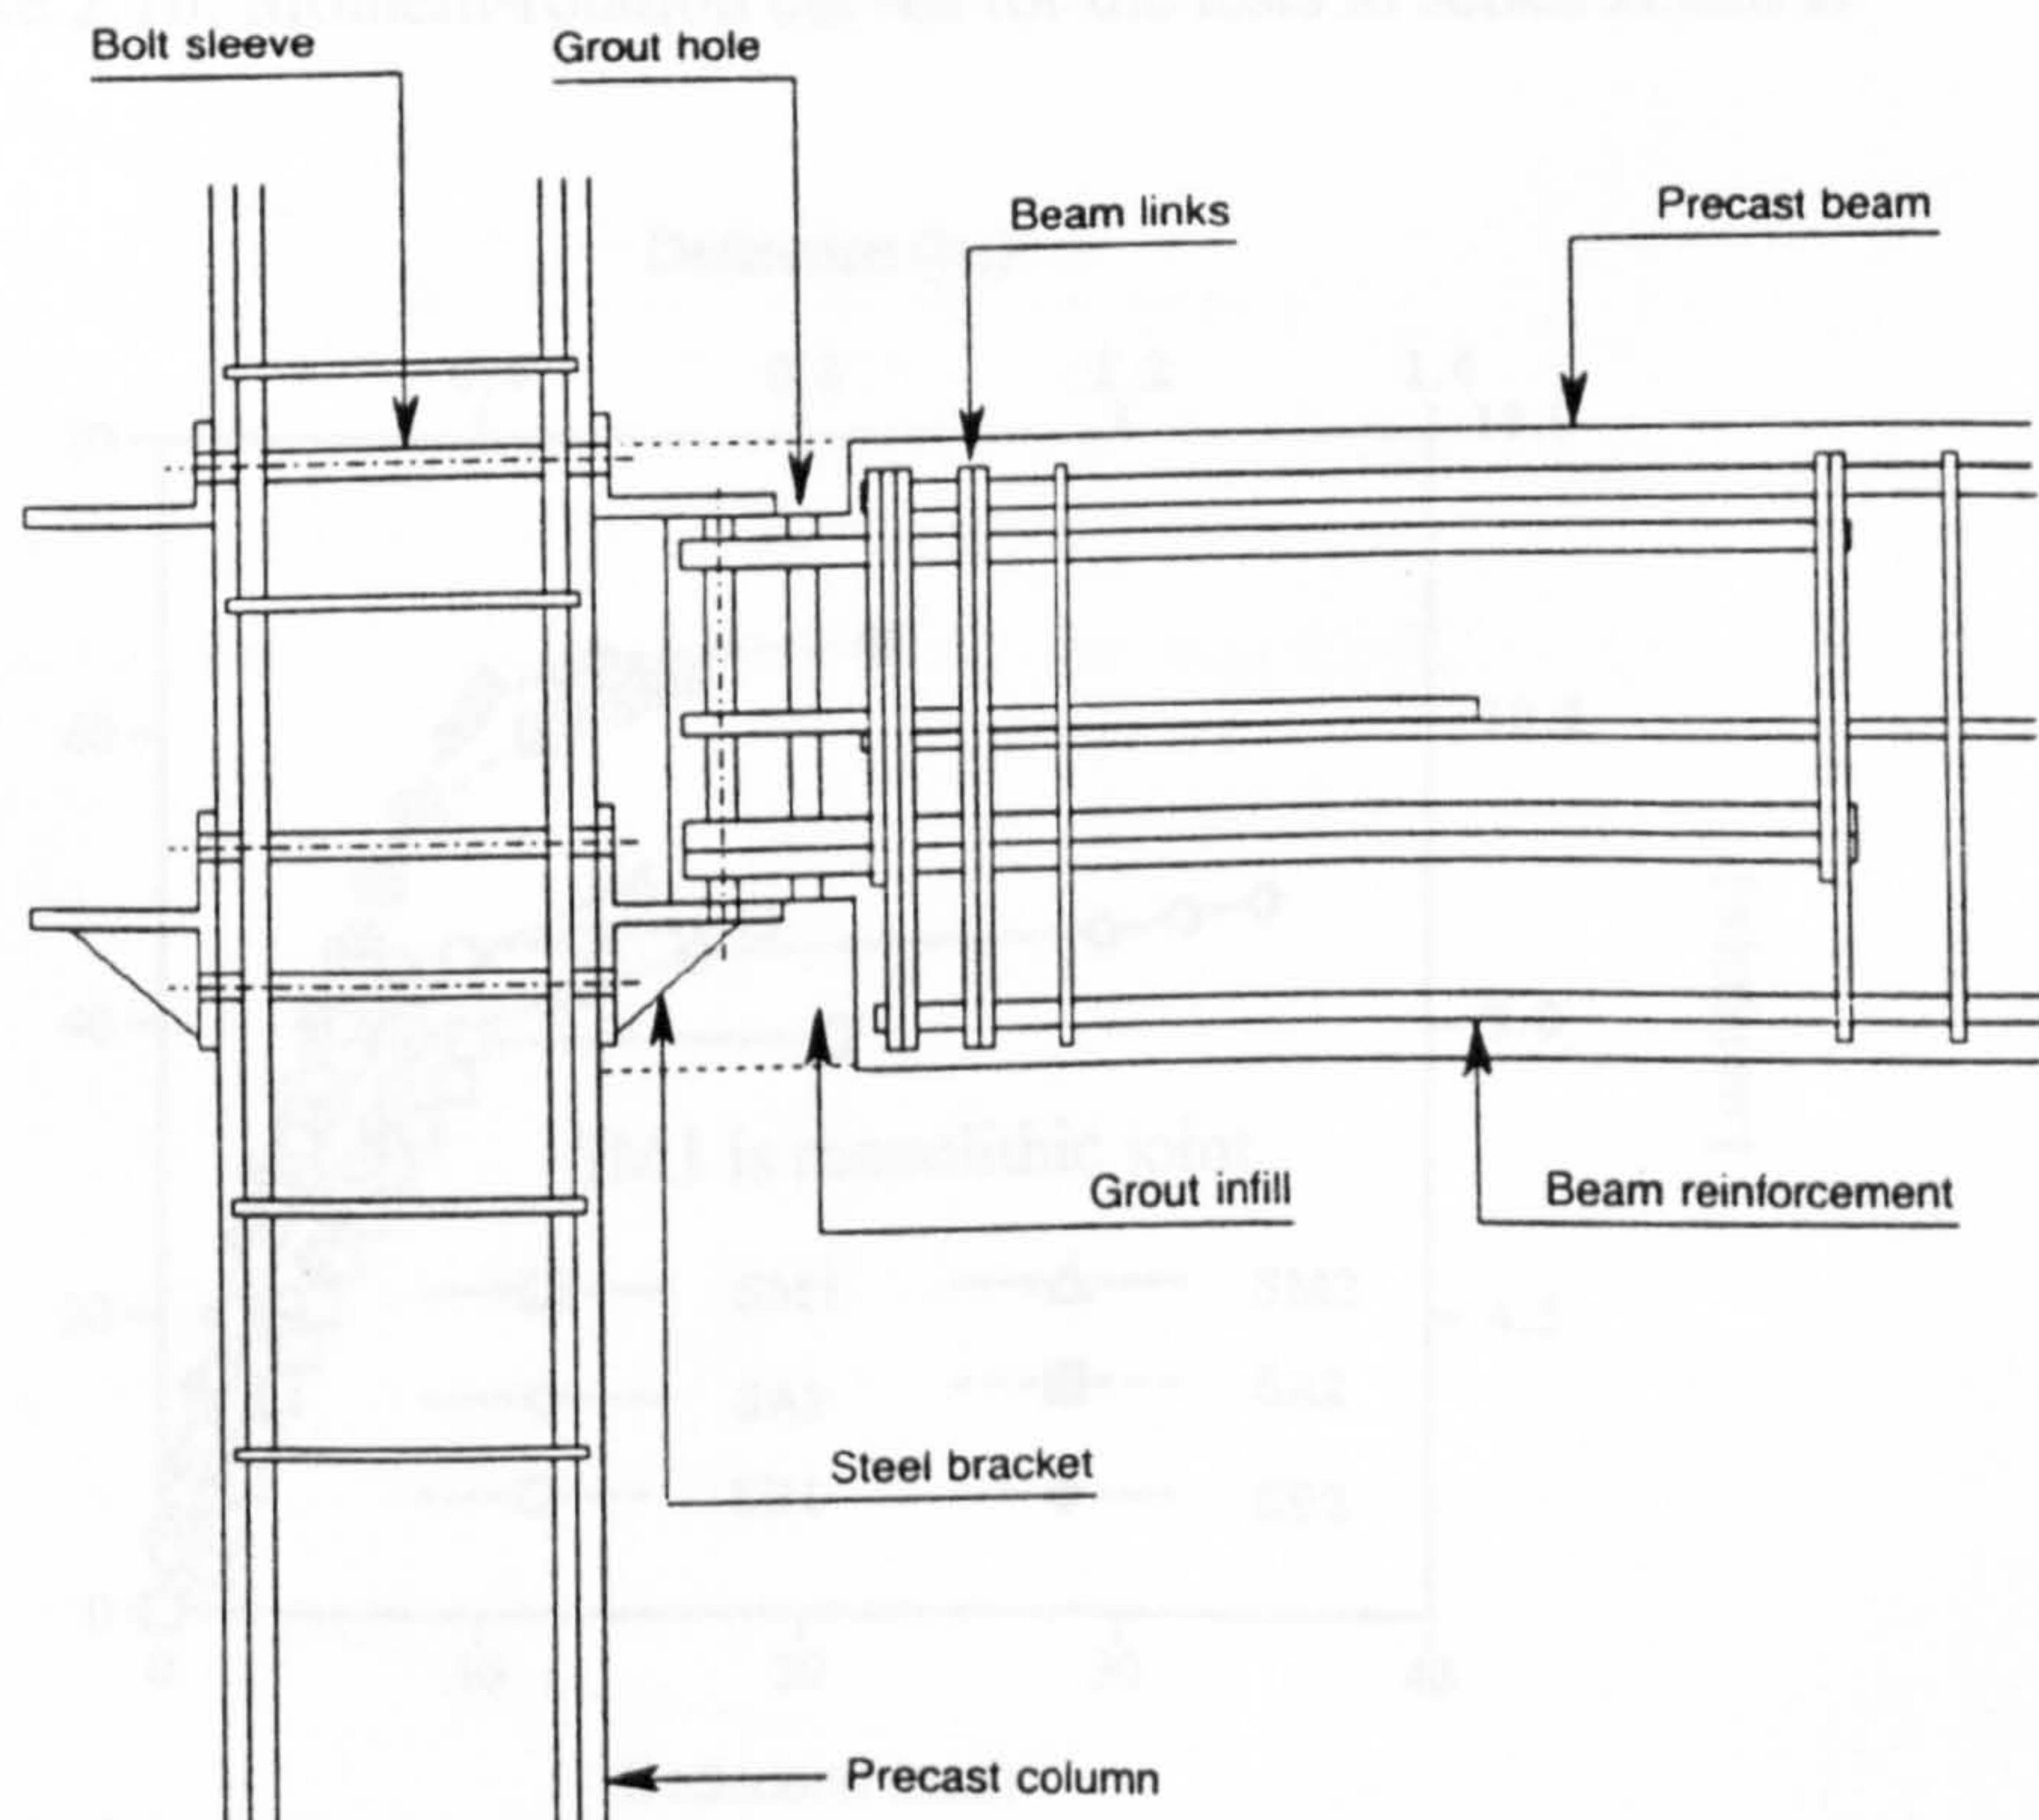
Typical details of a sleeved bolt beam-to-column connection
